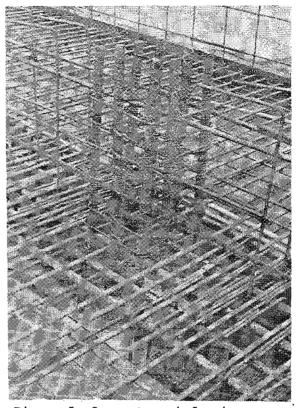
Concrete reinforcing arrangement at column-beam intersection.
